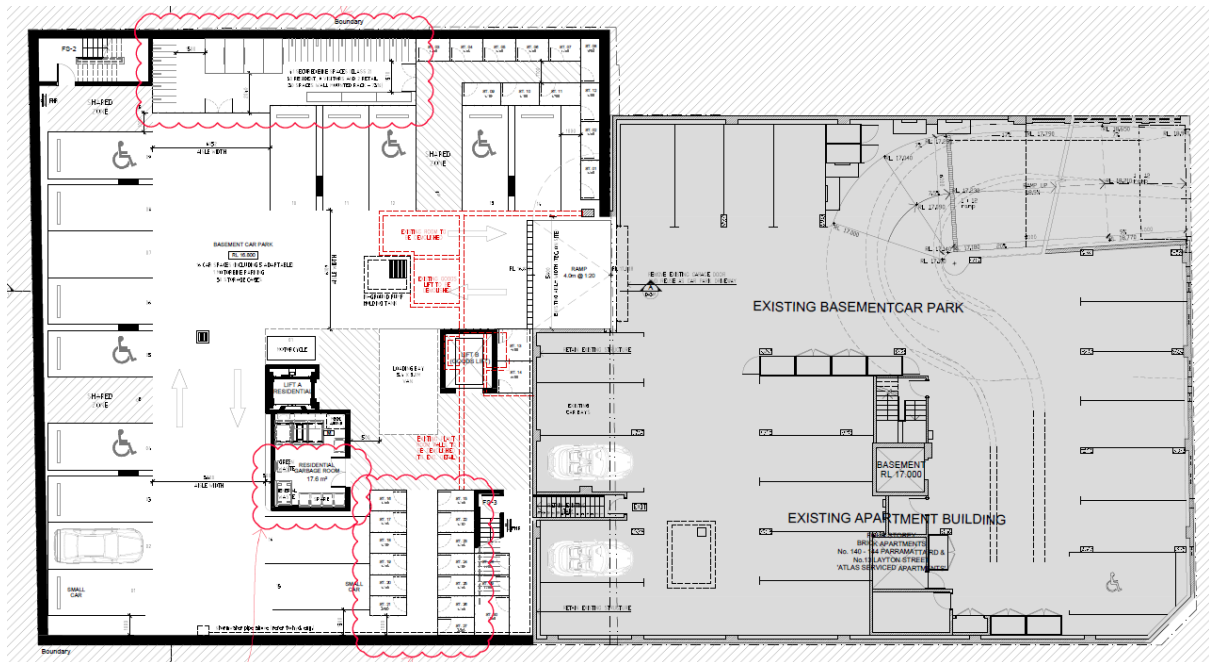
basement floor plan illustrated shared access with the existing serviced apartment site
